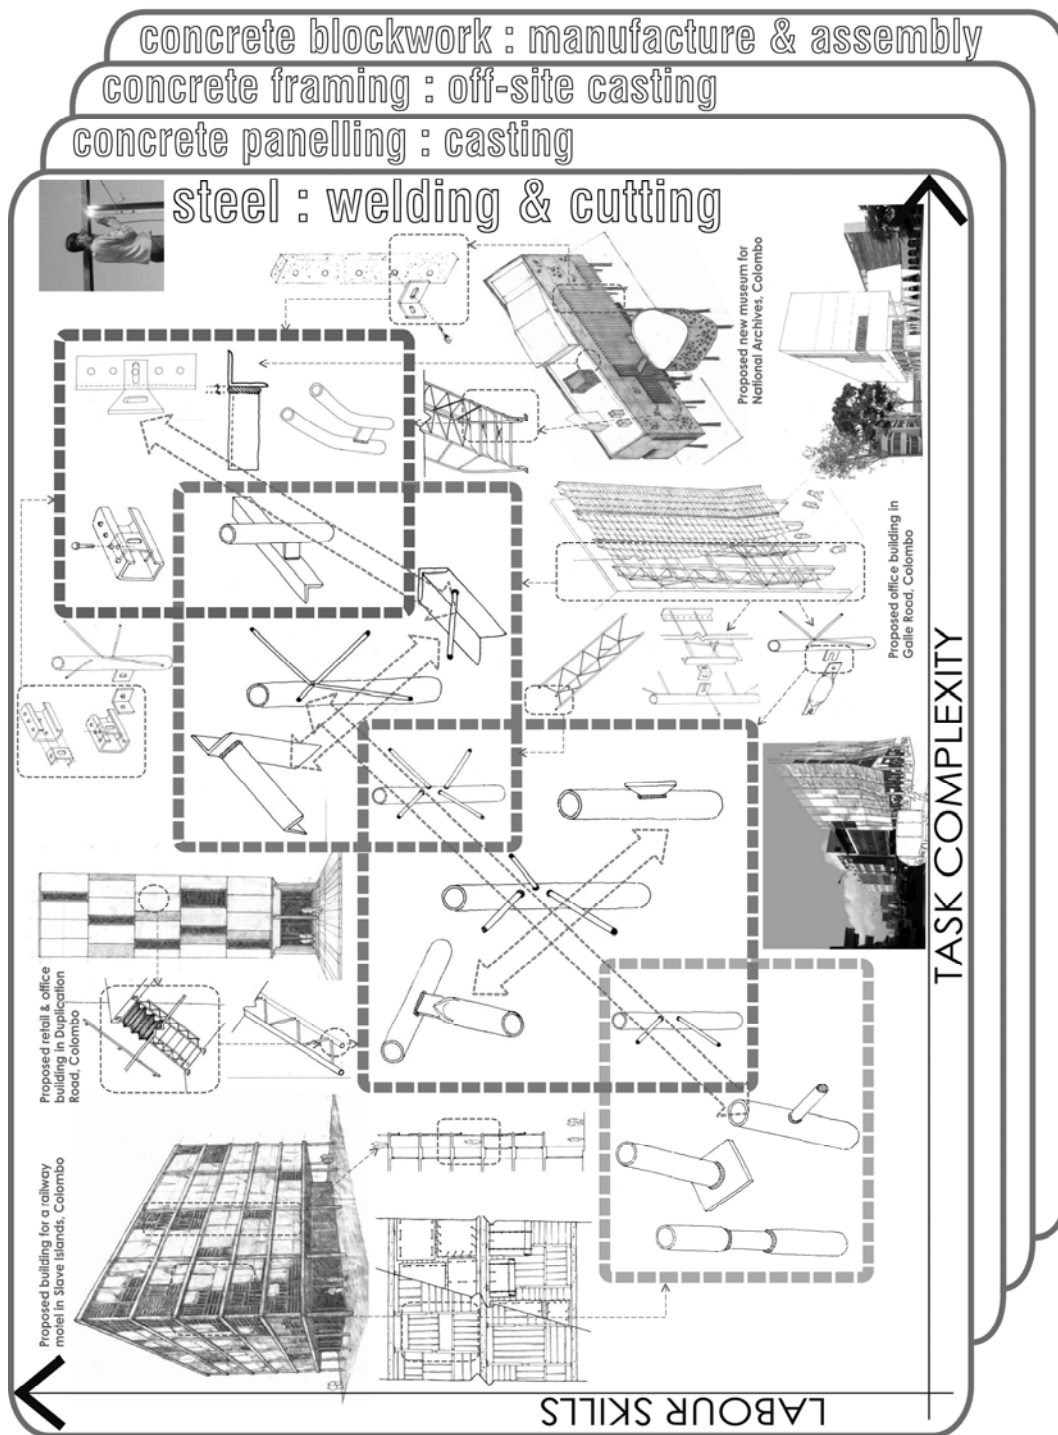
Cross-industrial labour up-skilling strategy for steel welding and cutting tasks
